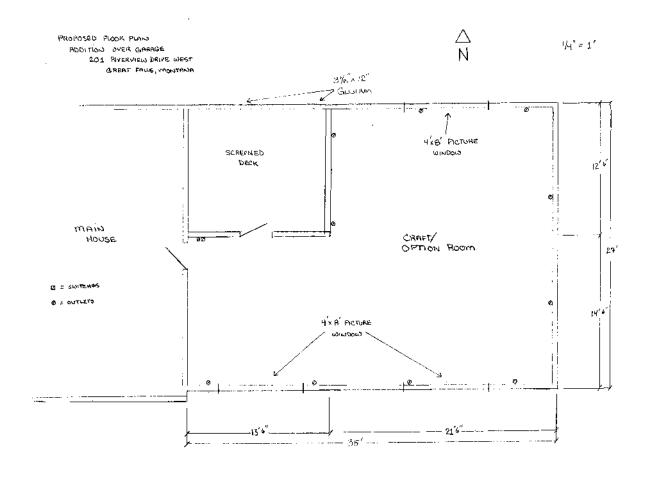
EXHIBIT D - FLOOR PLAN, ELEVATIONS
